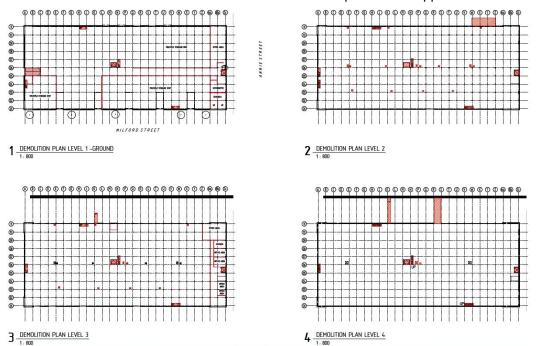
Demolition Plan (Source: Fairweather Jemmott Architecture)
